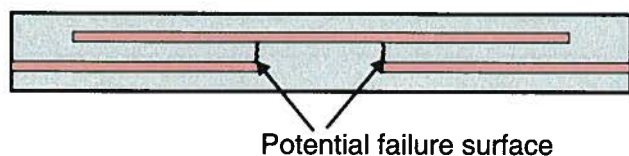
Horizontal shear failure mode for the configuration I panel.
